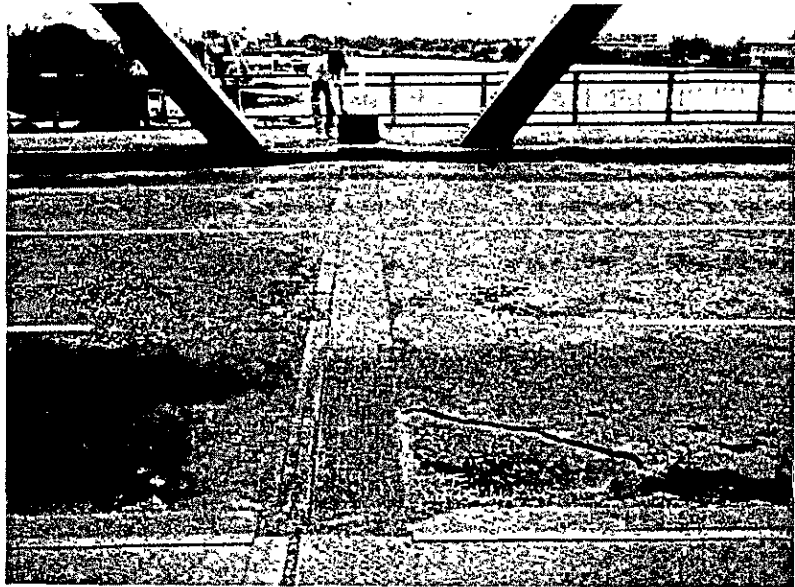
Expansion Joint between the Ends of Each Trussed Beams
